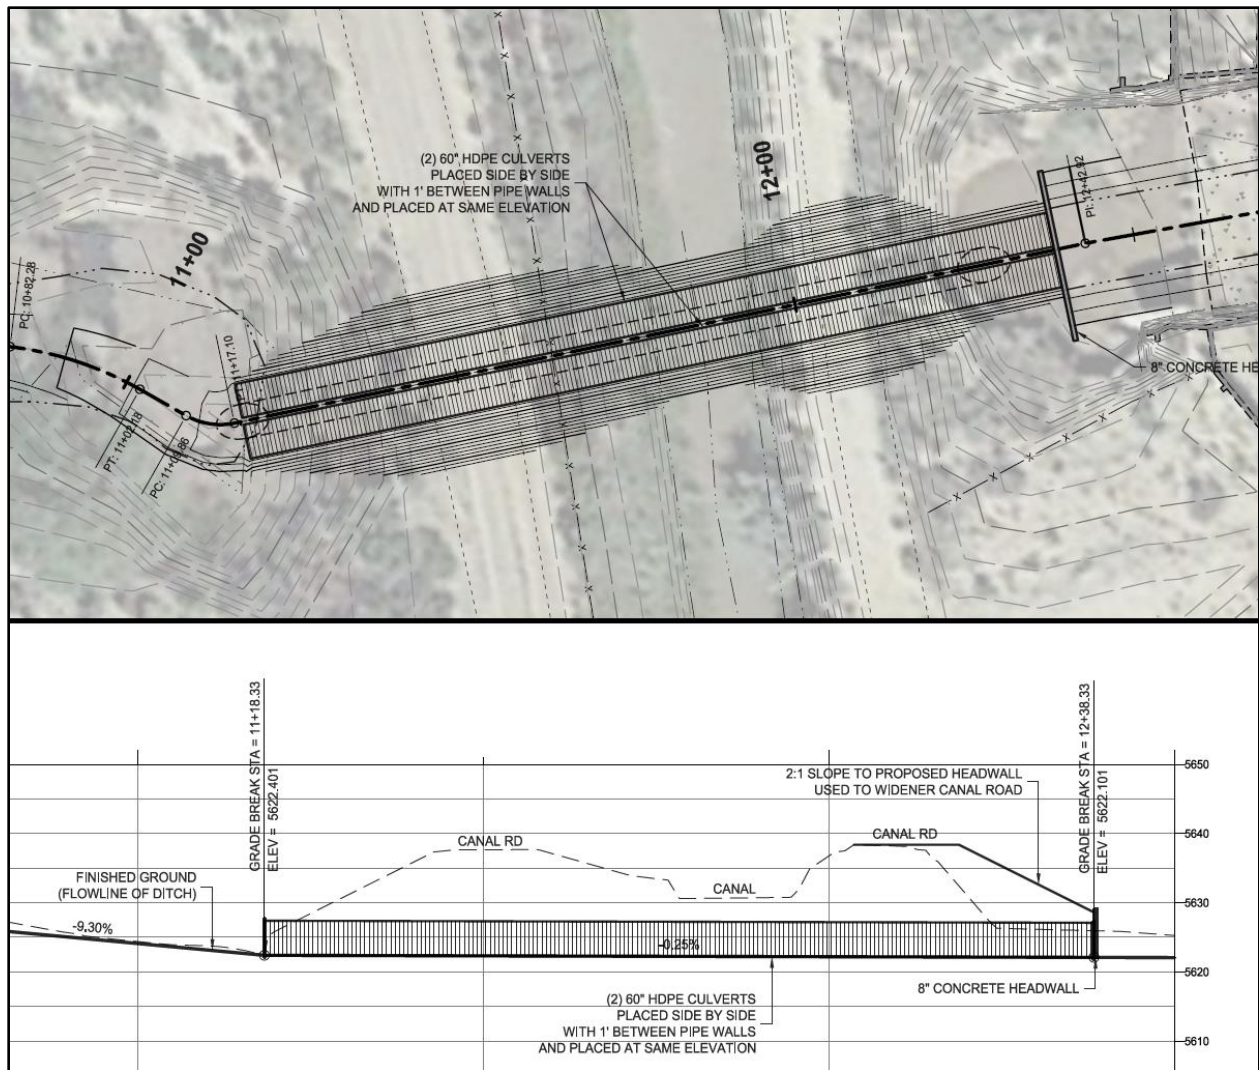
Preliminary plan and profile of new undershot (Jones & DeMille)
